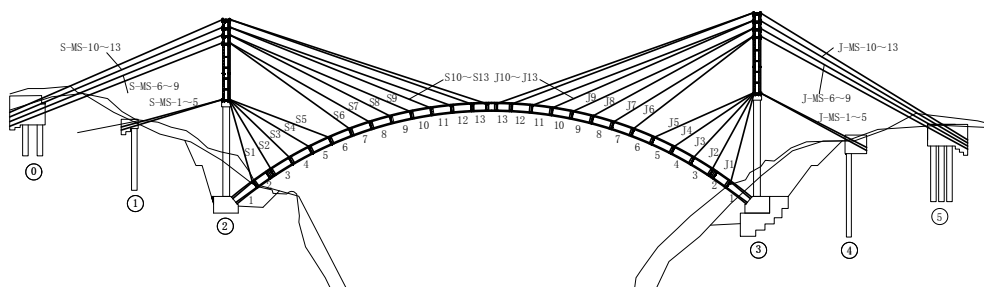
Stay and anchor cable layout of MUPENG Bridge.
